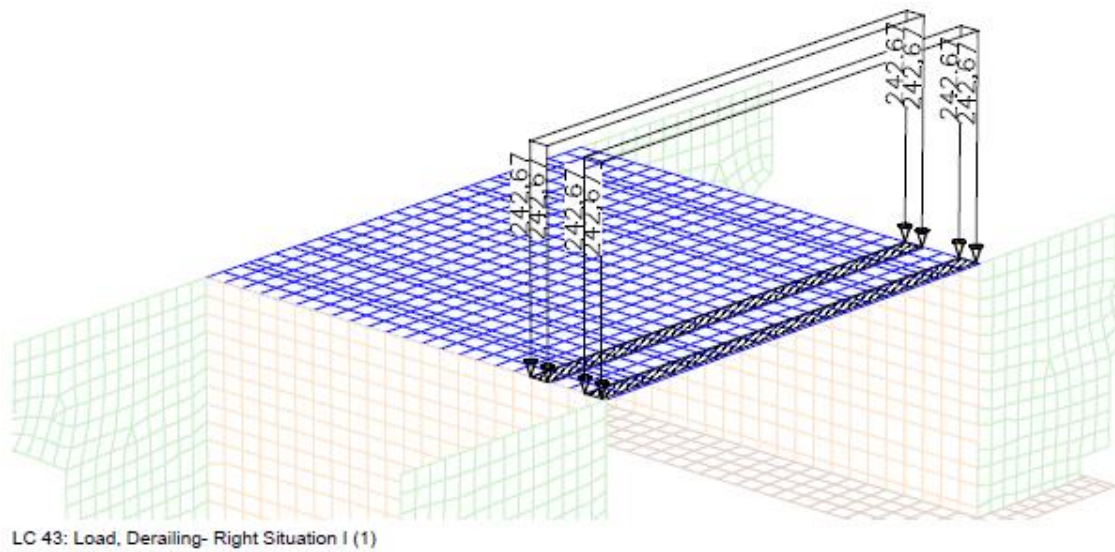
63 Derailment actions, Design Situation I, Right side, corner location
